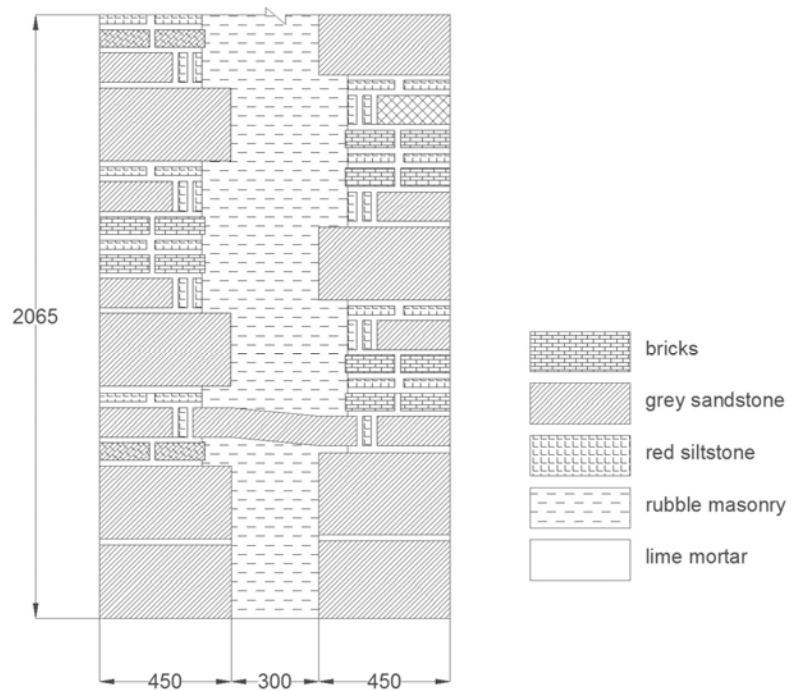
Sectional wall configuration 2 with connecting stones and legend
